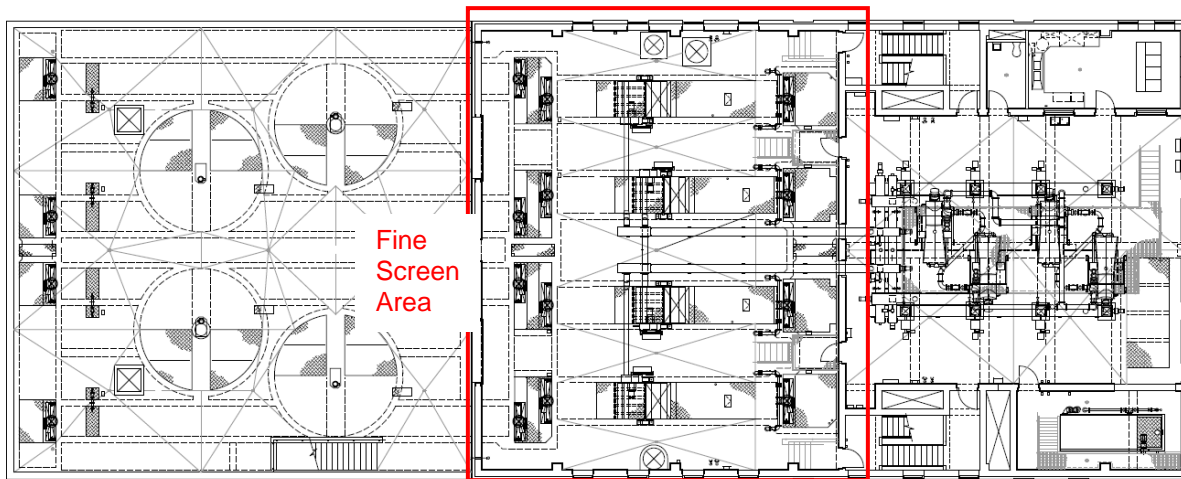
Existing Building K Plan with Fine Screen Area Highlighted
